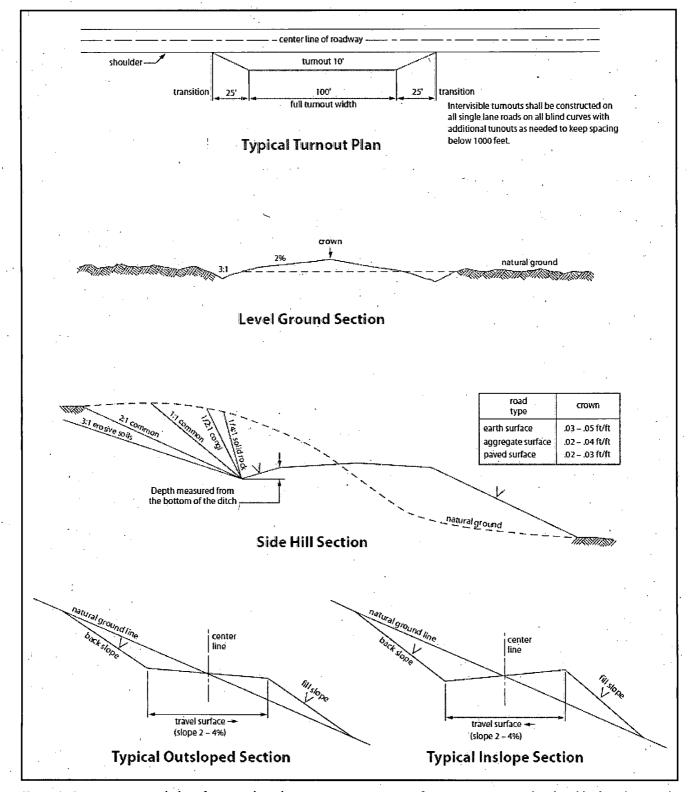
Cross-sections and plans for typical road sections representative of BLM resource or FS local and higher-class roads.
